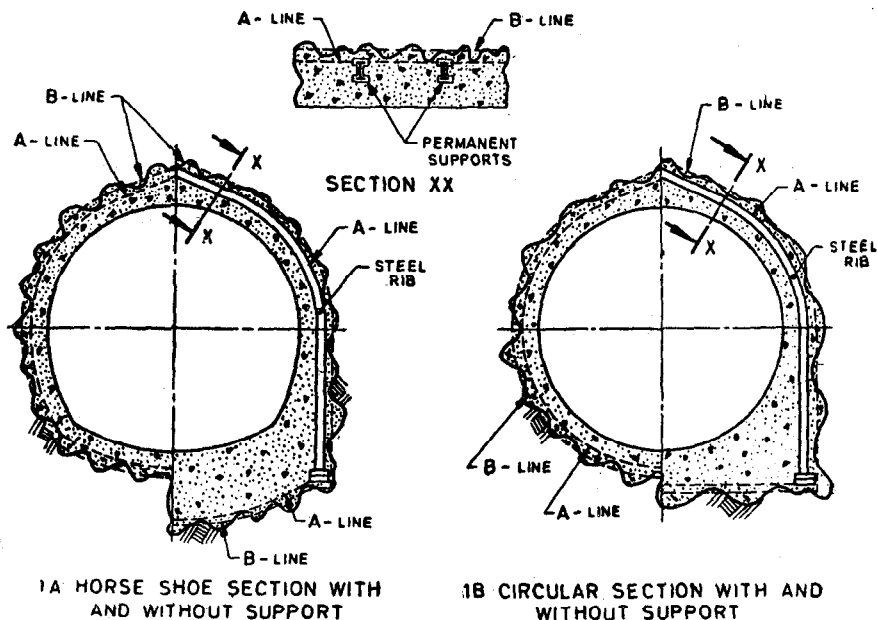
TYPICAL SECTION OF CONCRETE-LINED TUNNELS
